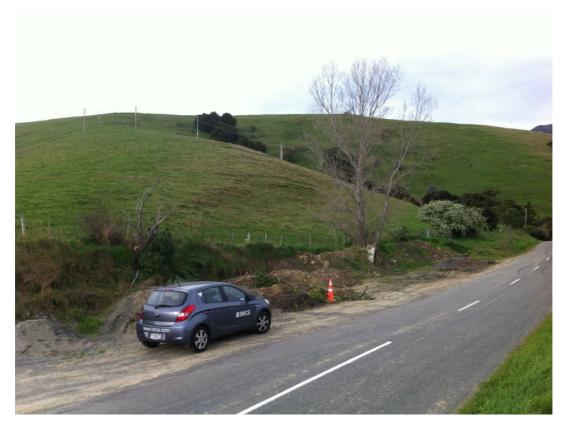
View of proposed Akaroa WWTP site on Old Coach Road
